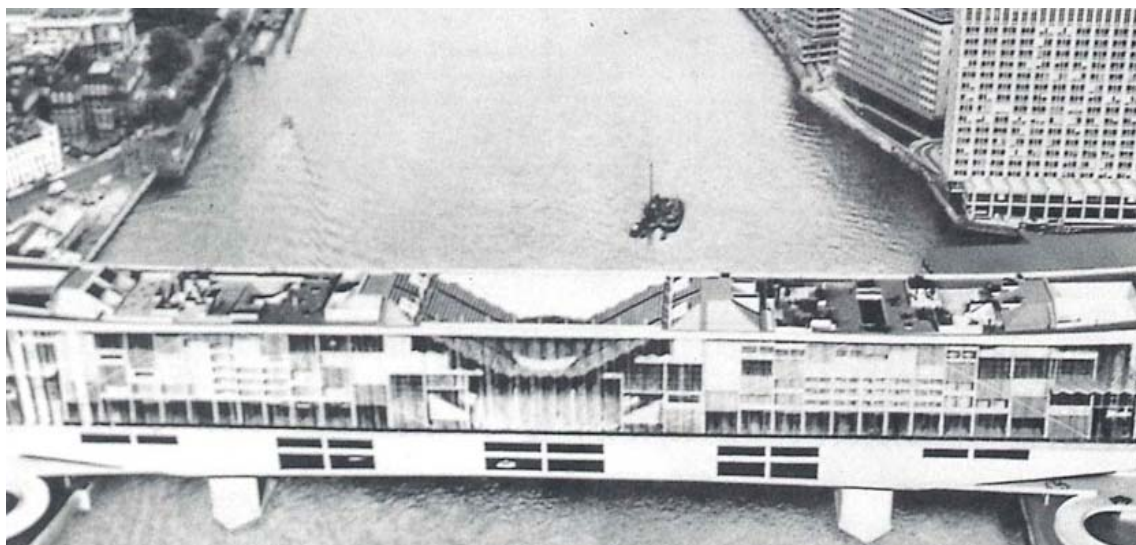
Crystal Span Bridge (Ove Arup archive)
